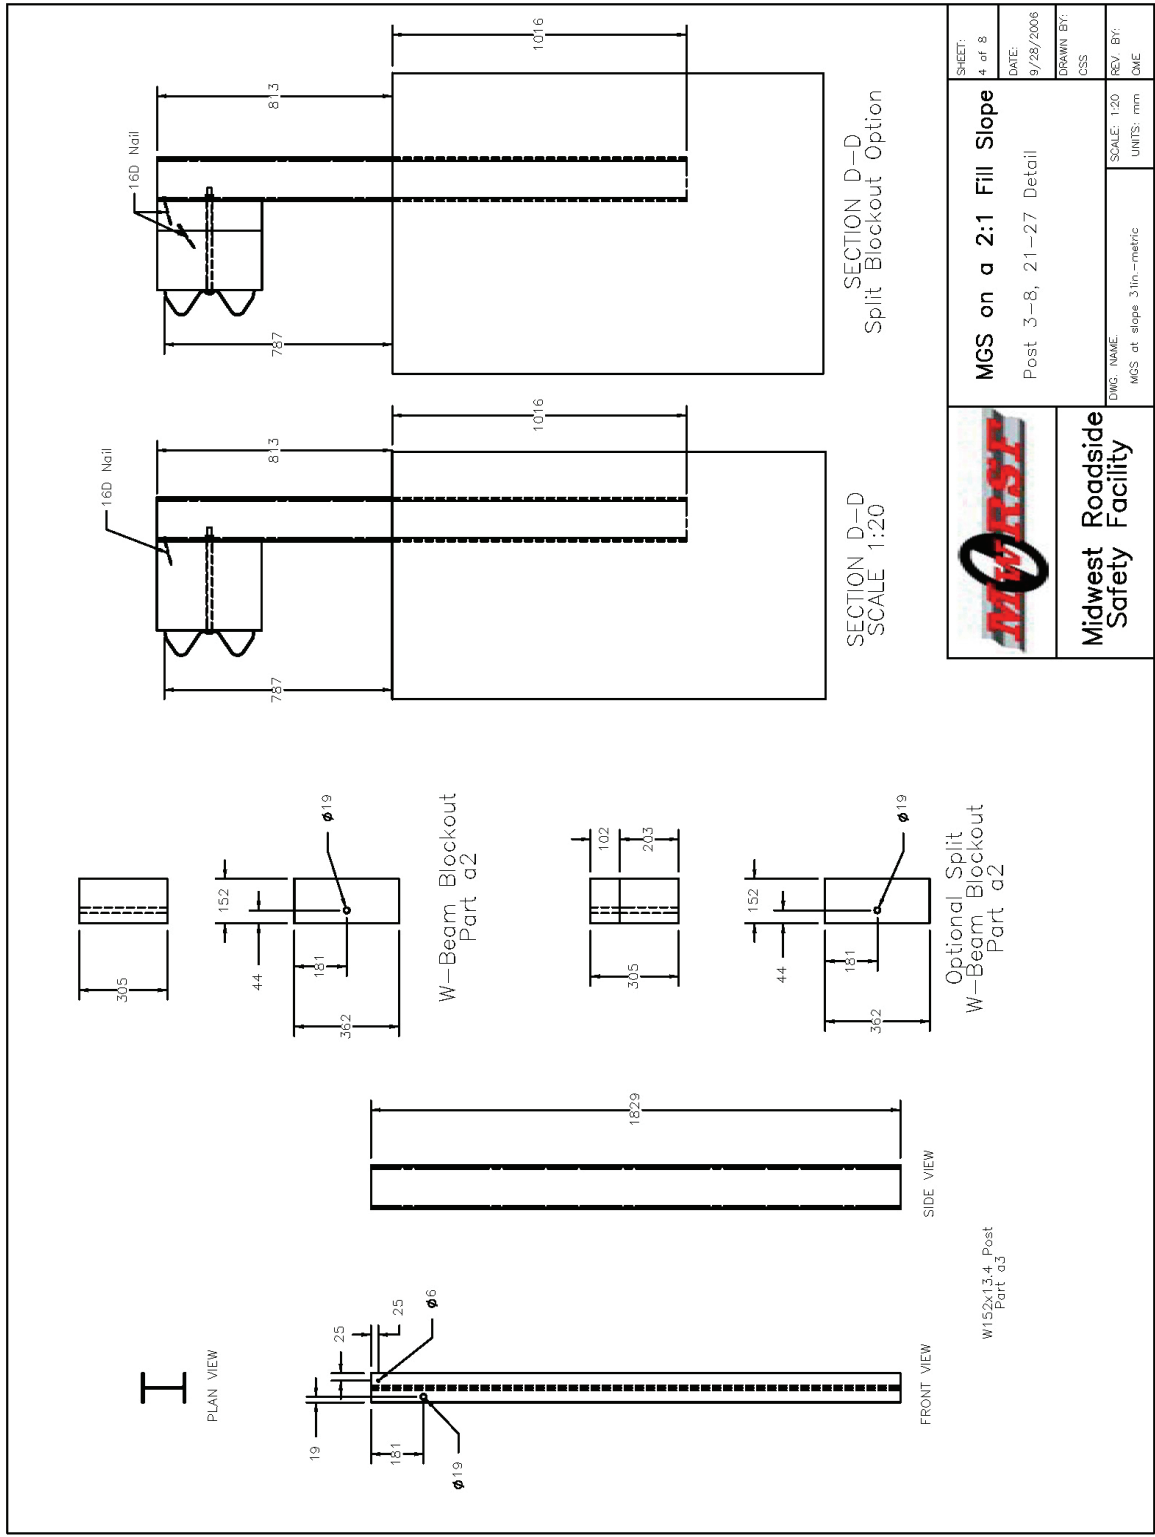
MGS Installed Adjacent to a 2:1 Fill Slope System Modifications, Test No. MGS221-2
